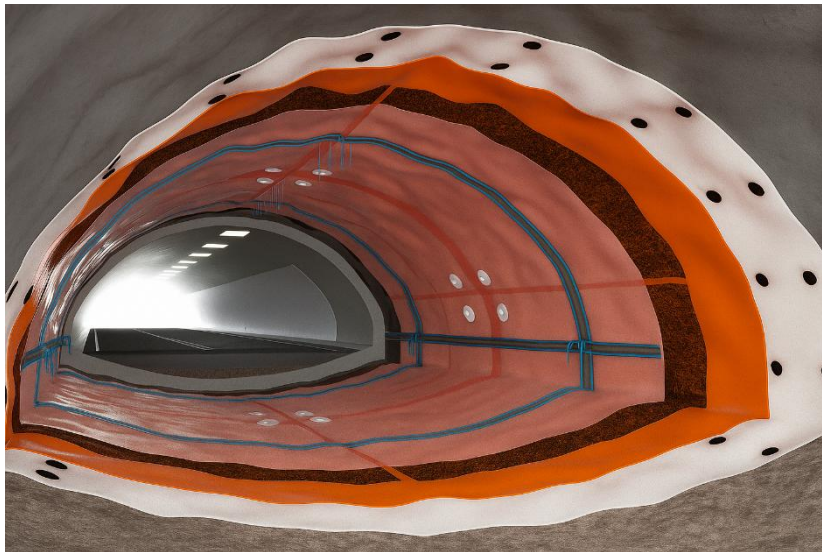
Cross-sectional view of the waterproofing system in tunnels [4]
